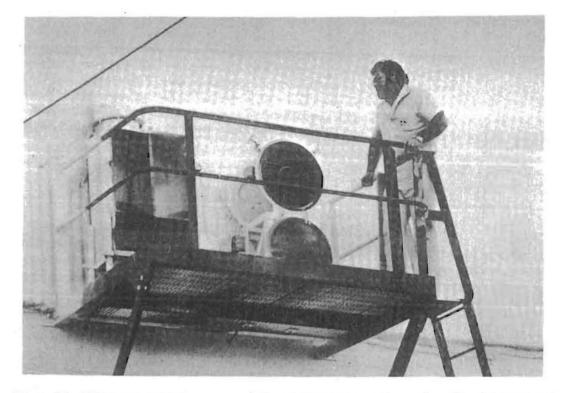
Pressure relief vent and fan built into gable end wall of horizontal storage at Kellerberrin. The fan cover is opened while pressurising the storage and is sealed for the pressure decay and leak detection test.
